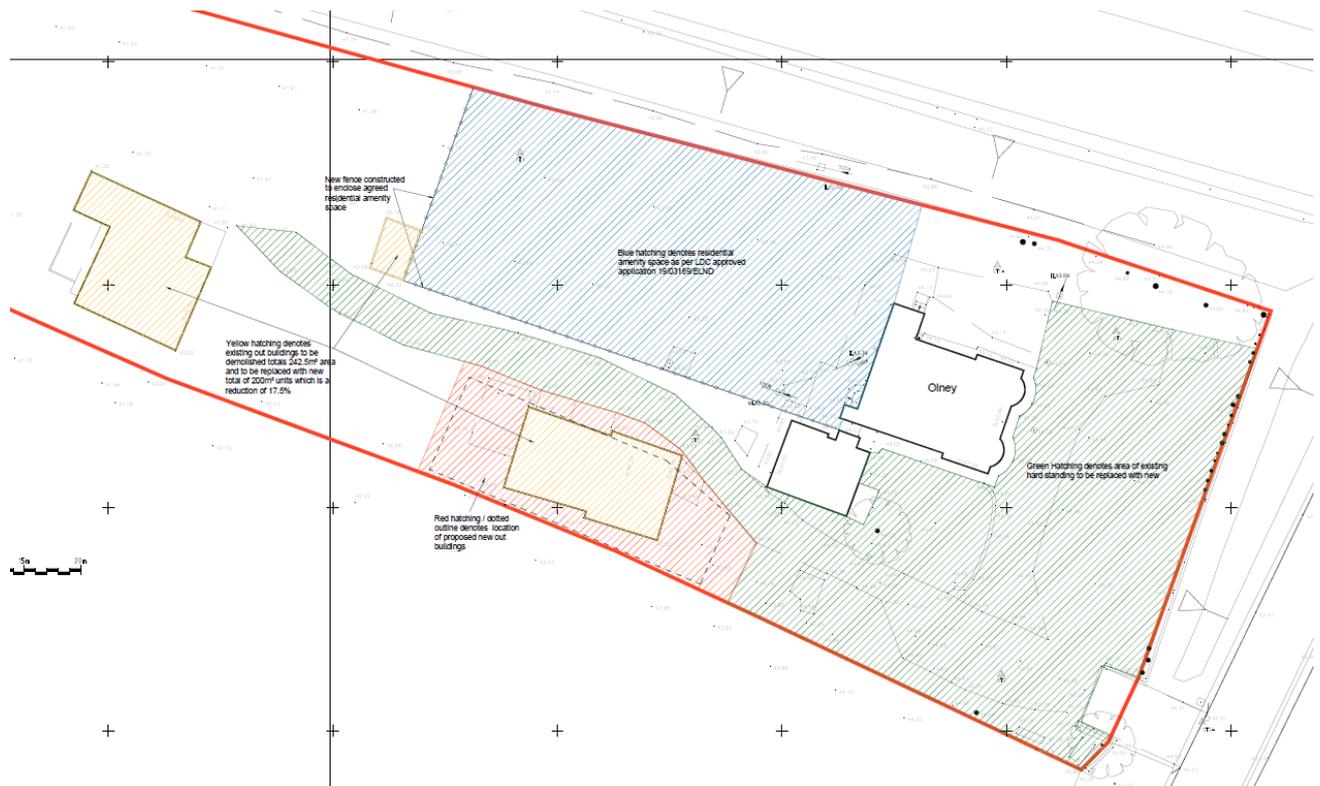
Proposed Site Plan (Existing outbuildings to be demolished in yellow, proposed outbuilding in red)
